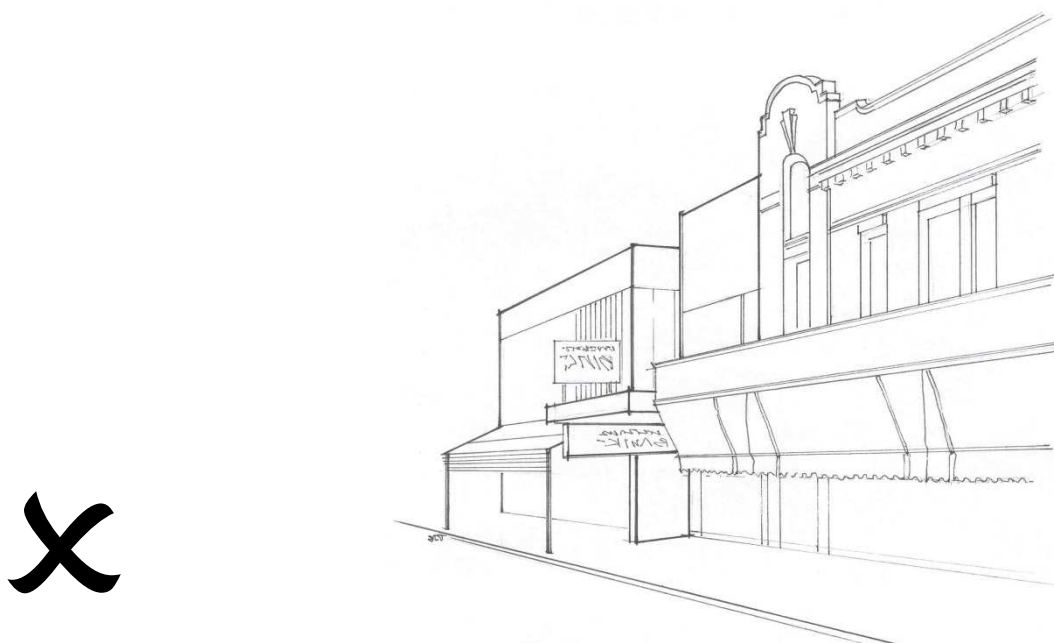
Bulky buildings can be visually broken down into smaller components to better reflect the character of their neighbours. The bulk of the central building has been placed behind a smaller facade so it does not dominate the streetscape.
